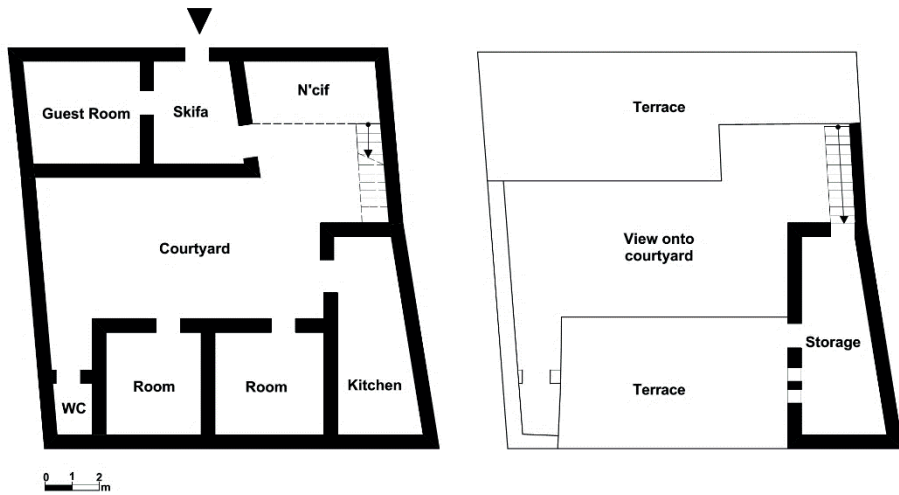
A typical traditional house plan in Dachra El-Hamra, El-Kantara. The plans have been redrawn and adopted by authors after referencing [10].
